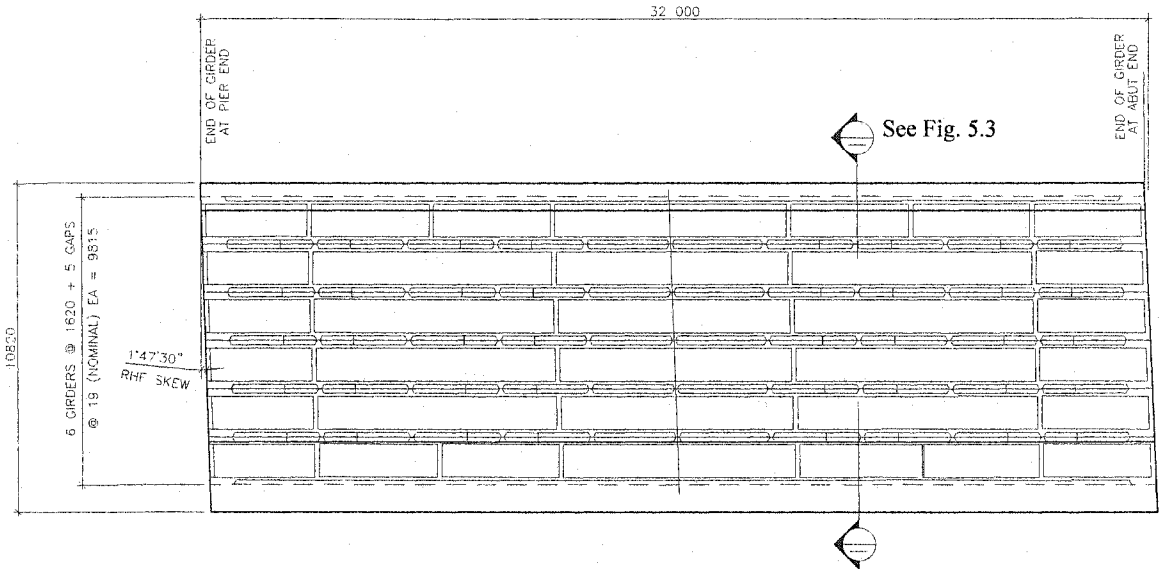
Plan of the 99th Ave. bridge in Fort Saskatchewan
